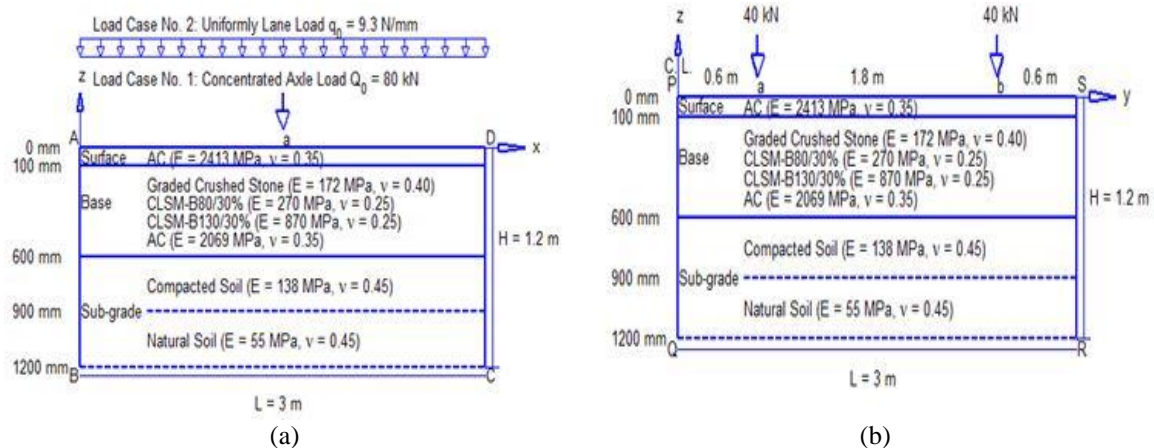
Schematic of flexible pavements: (a) longitudinal cross section (b) transverse cross section.
